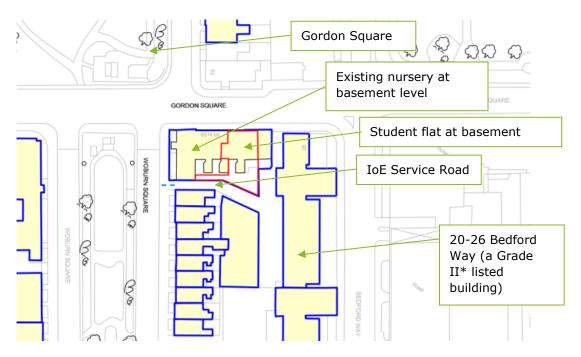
Site Location Plan (extract of the Site Location Plan prepared by Kendall Kingscott).
